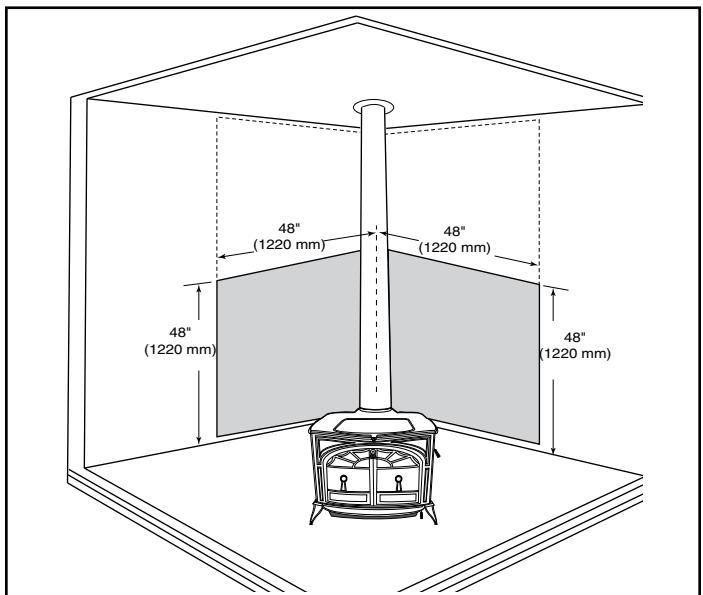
Corner installation, vertical chimney connector, two wall shields. Reduced side clearances. Wall shield MUST meet at corner.
